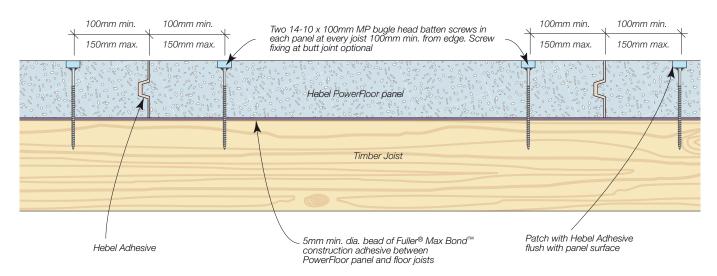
Cross-section of Hebel Hebel PowerFloor Panel Installation
